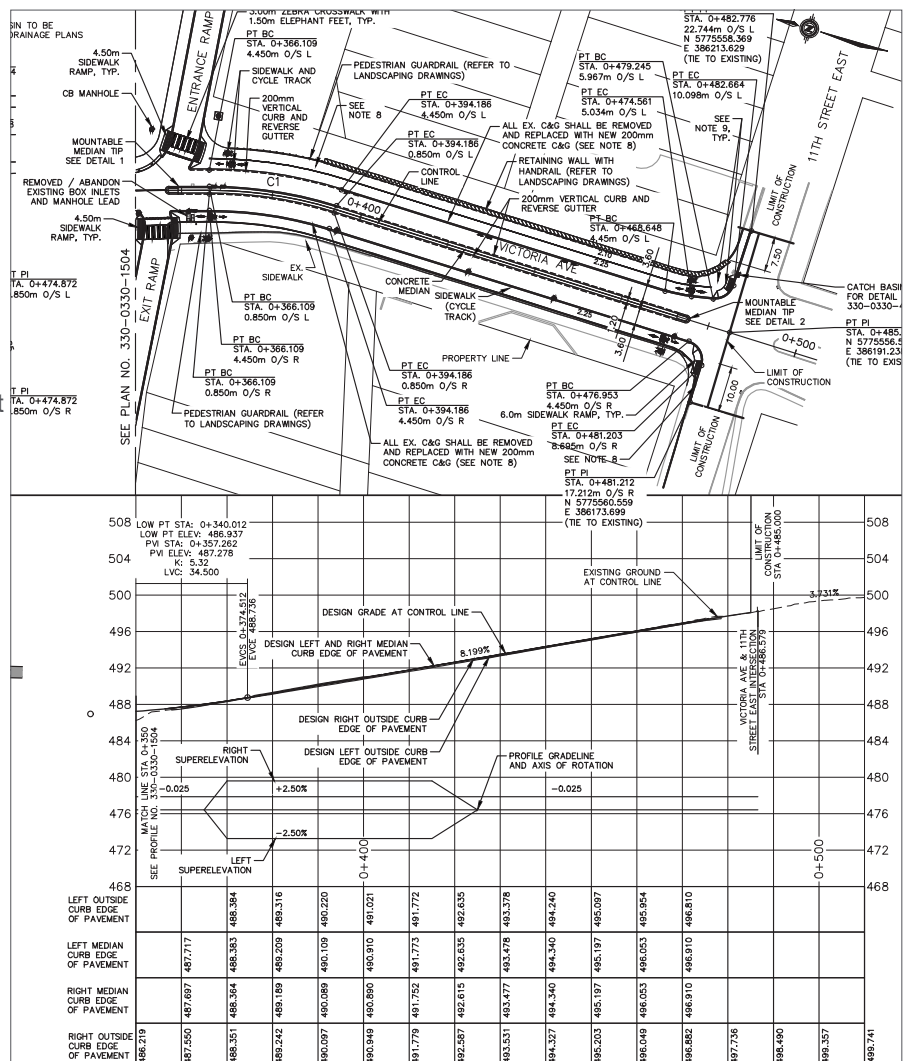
Plan and profile from Traffic Bridge Roadway Drawings for Victoria Avenue (Source: City of Saskatoon)
